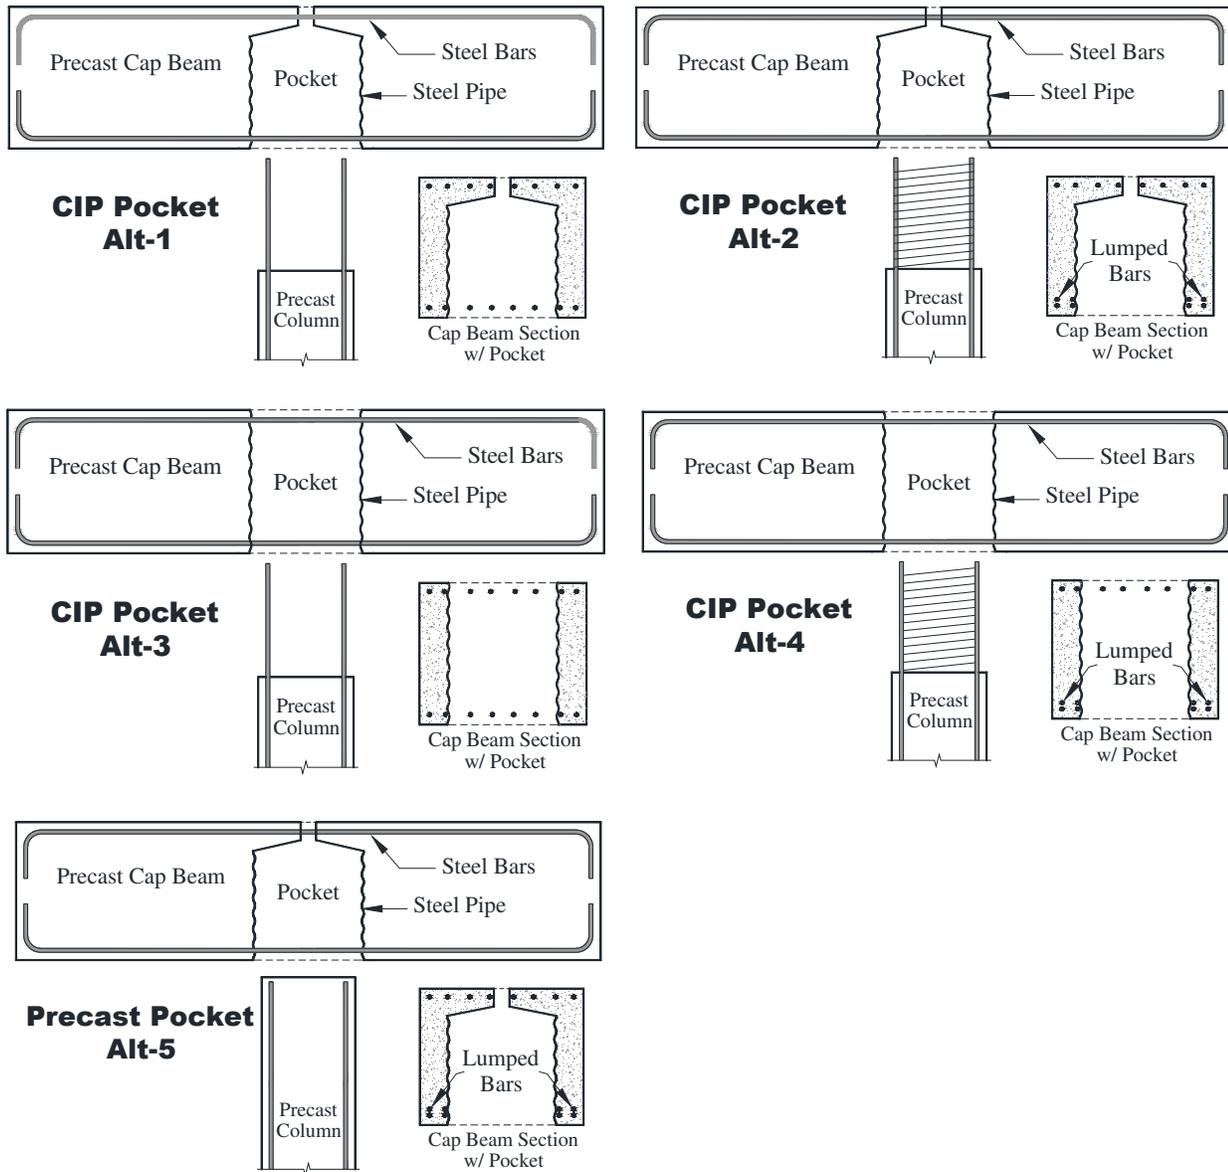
Detailing Alternatives for Pocket Connections
